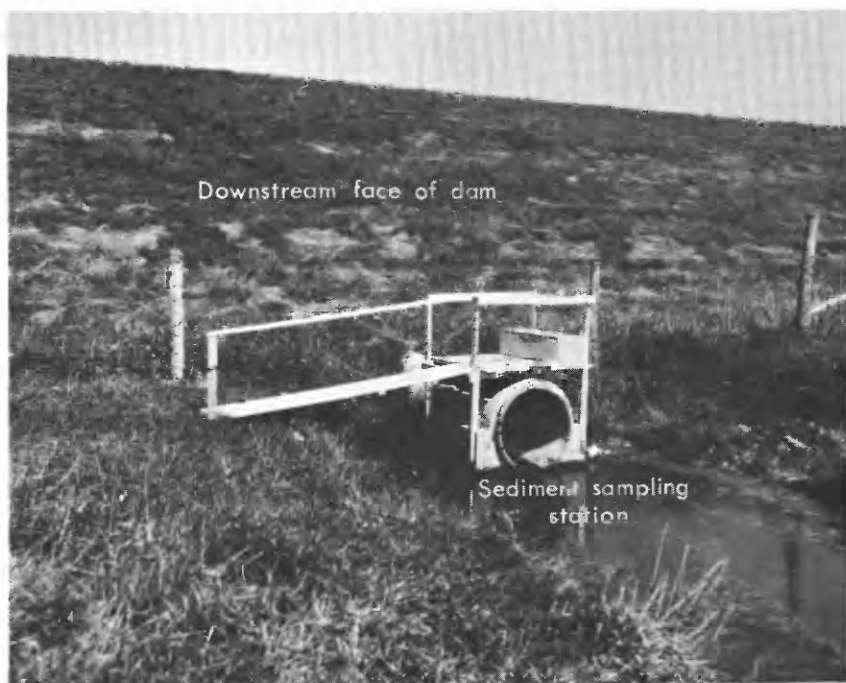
Downstream face of dam showing outlet sediment-sampling station. Reservoir stage is about 15.2 feet.
